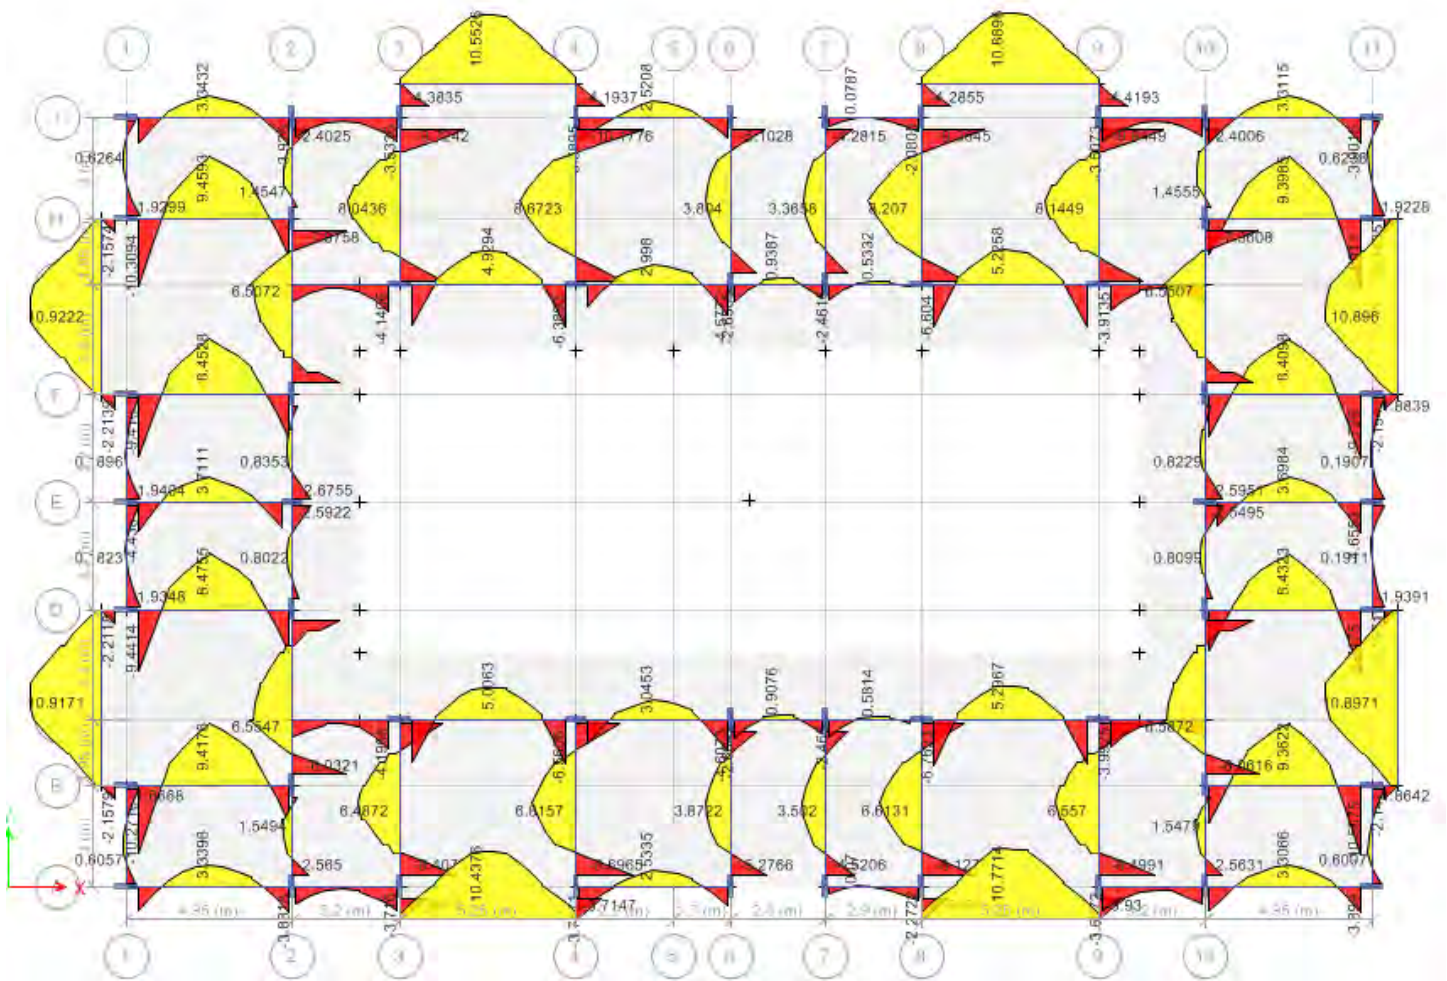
1st Floor Beam Moment diagram (M3-t.m)
